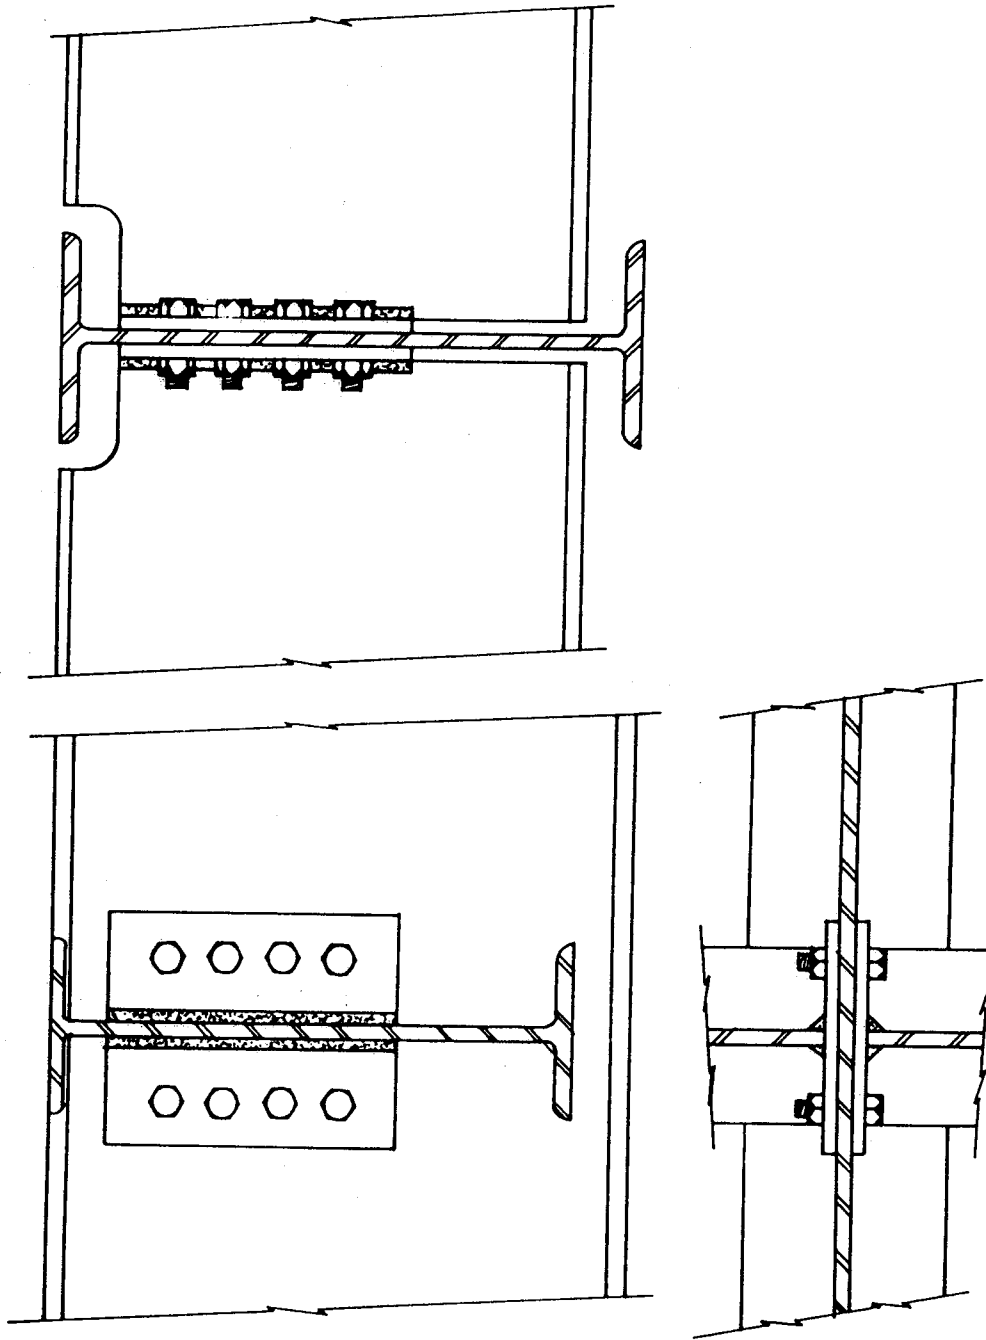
Double Flexible End Plate Connection to Beam Web Detail
